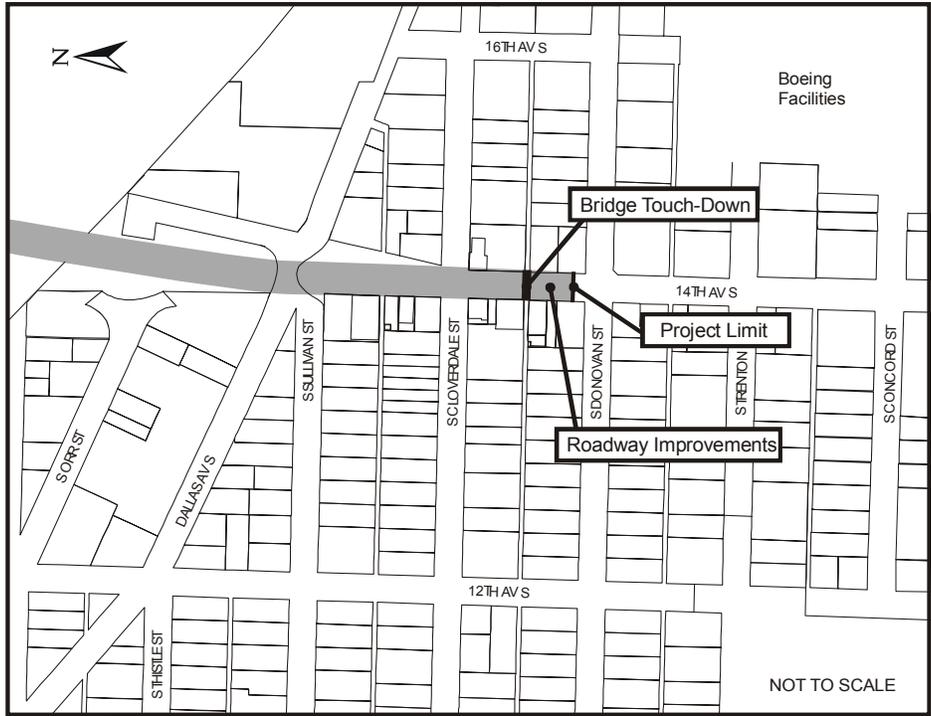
Mid-Level Fixed-Span Bridge Alternative Street Network
